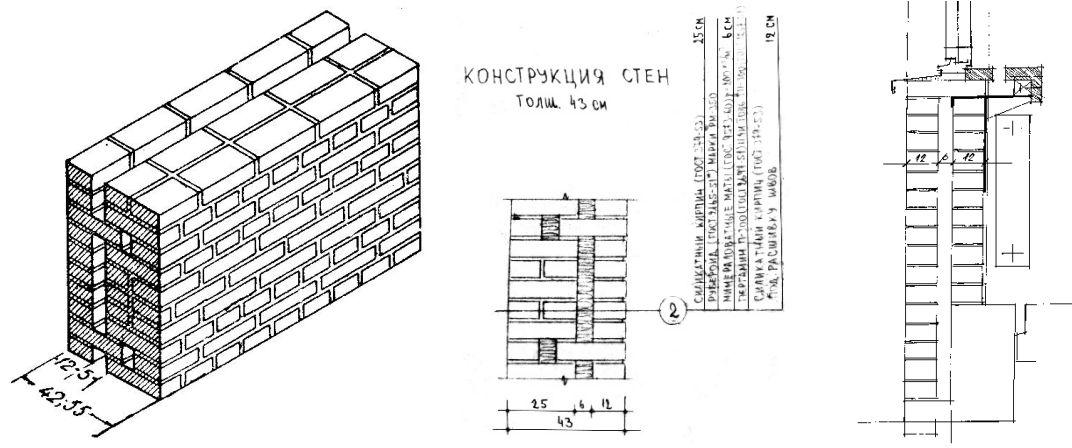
Sections of typical external walls of studied brick apartment buildings.
